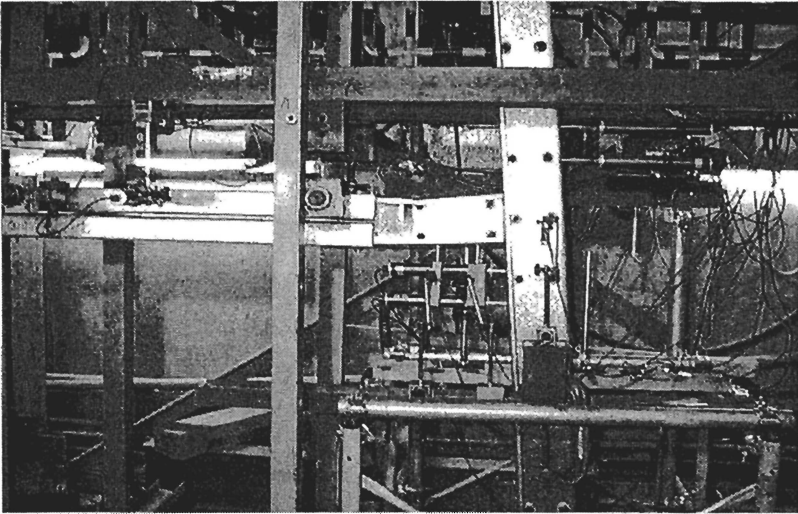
FFCs Flexural failure of connected cold-formed steel section
